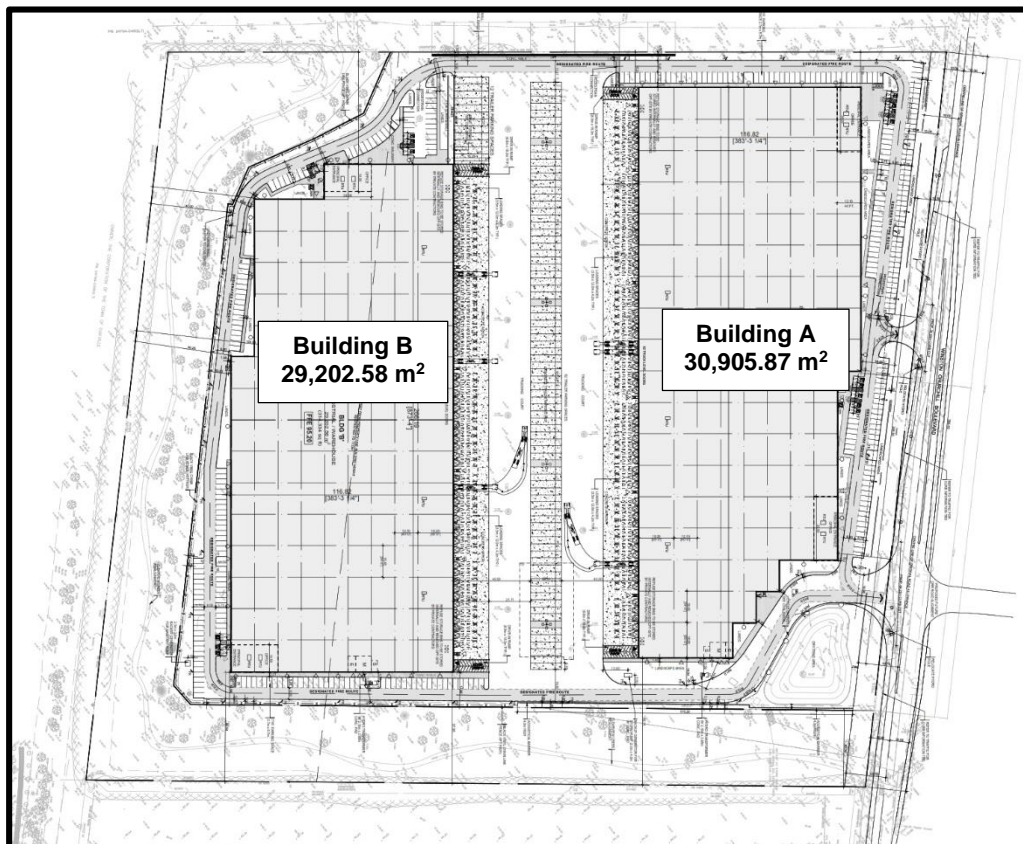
700 and 750 Winston Churchill Site Plan (Jan 2022)
